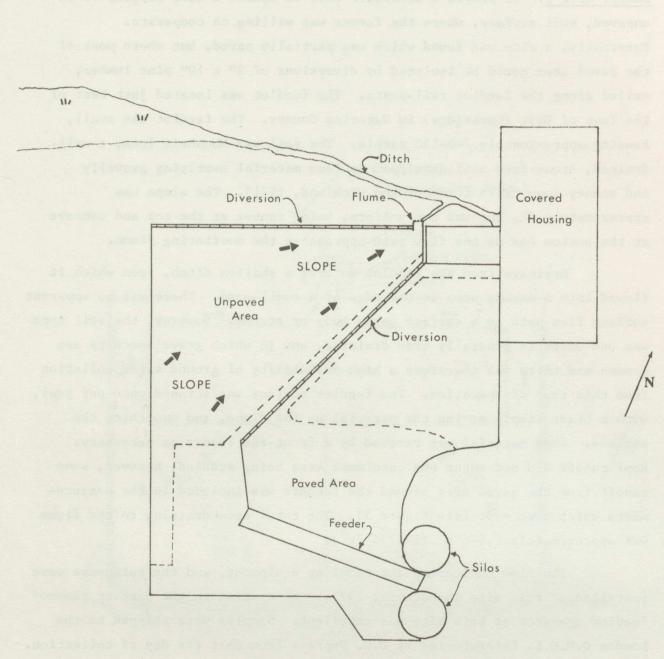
Sketch Plan of Feedlot, Site #1
